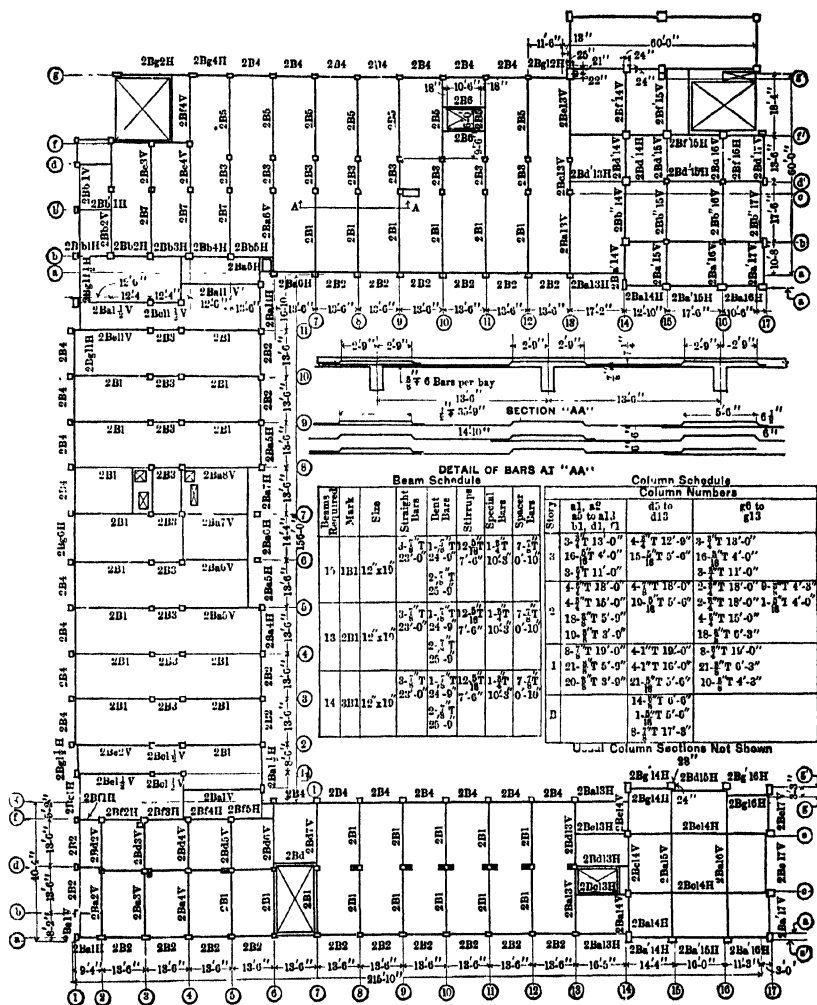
Typical Framing Plan and Steel Schedules. (See p. 617.)
